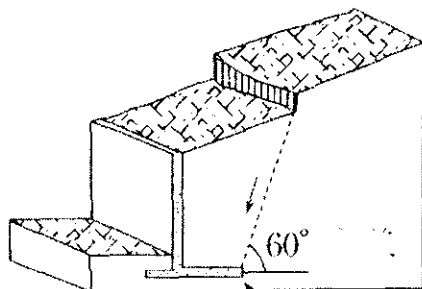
Cracks in the Surface of the Soil behind the Wall
